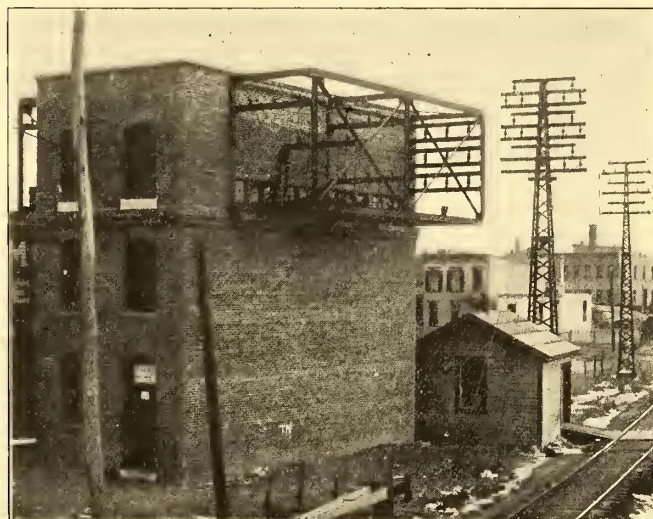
ARRESTER HOUSE AT DUTCHKILLS STREET
